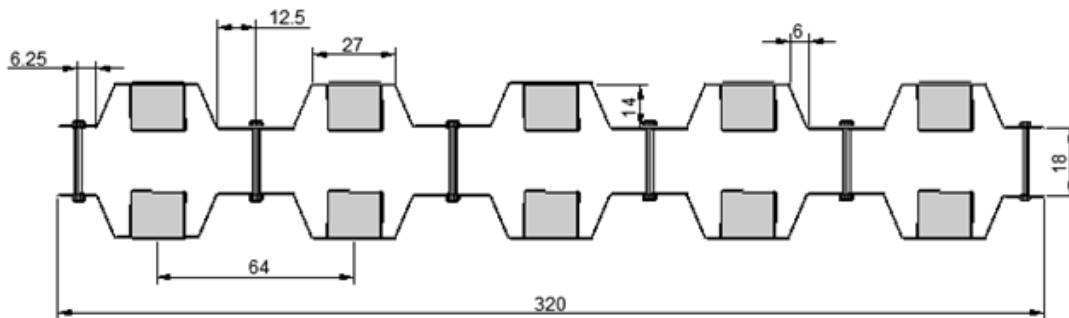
Cross section of double steel skin composite wall (dimensions in mm)
